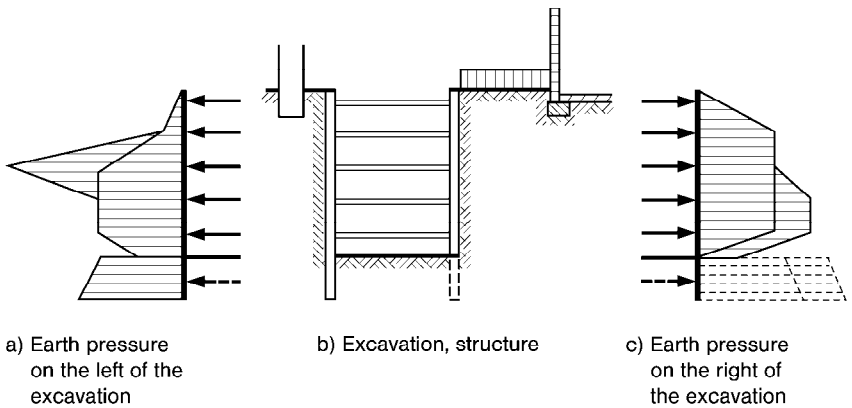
Excavation with horizontal bracing and bilateral loading from a structure
